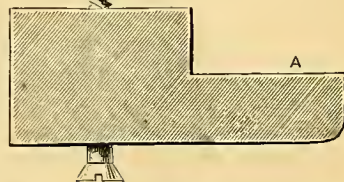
MODE OF SECURING BOARDS TO MANTELPIECE.
